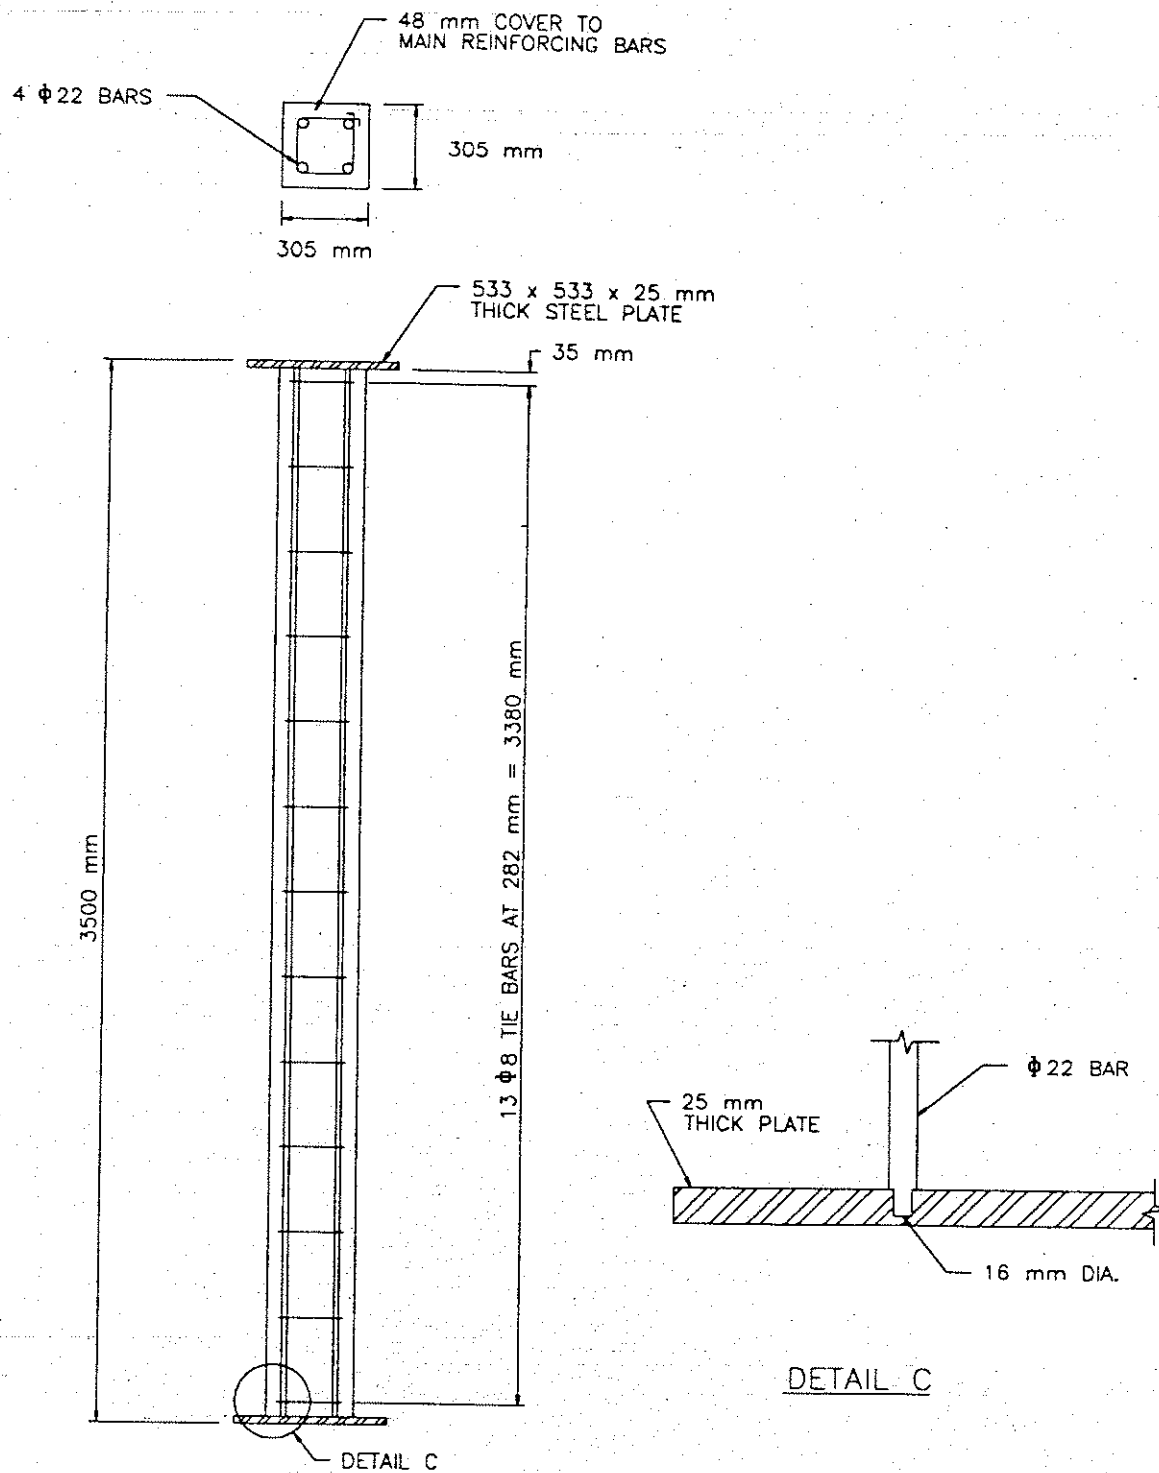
Elevation, Cross-Section and Finishing Detail: Column 3 and Column 4
